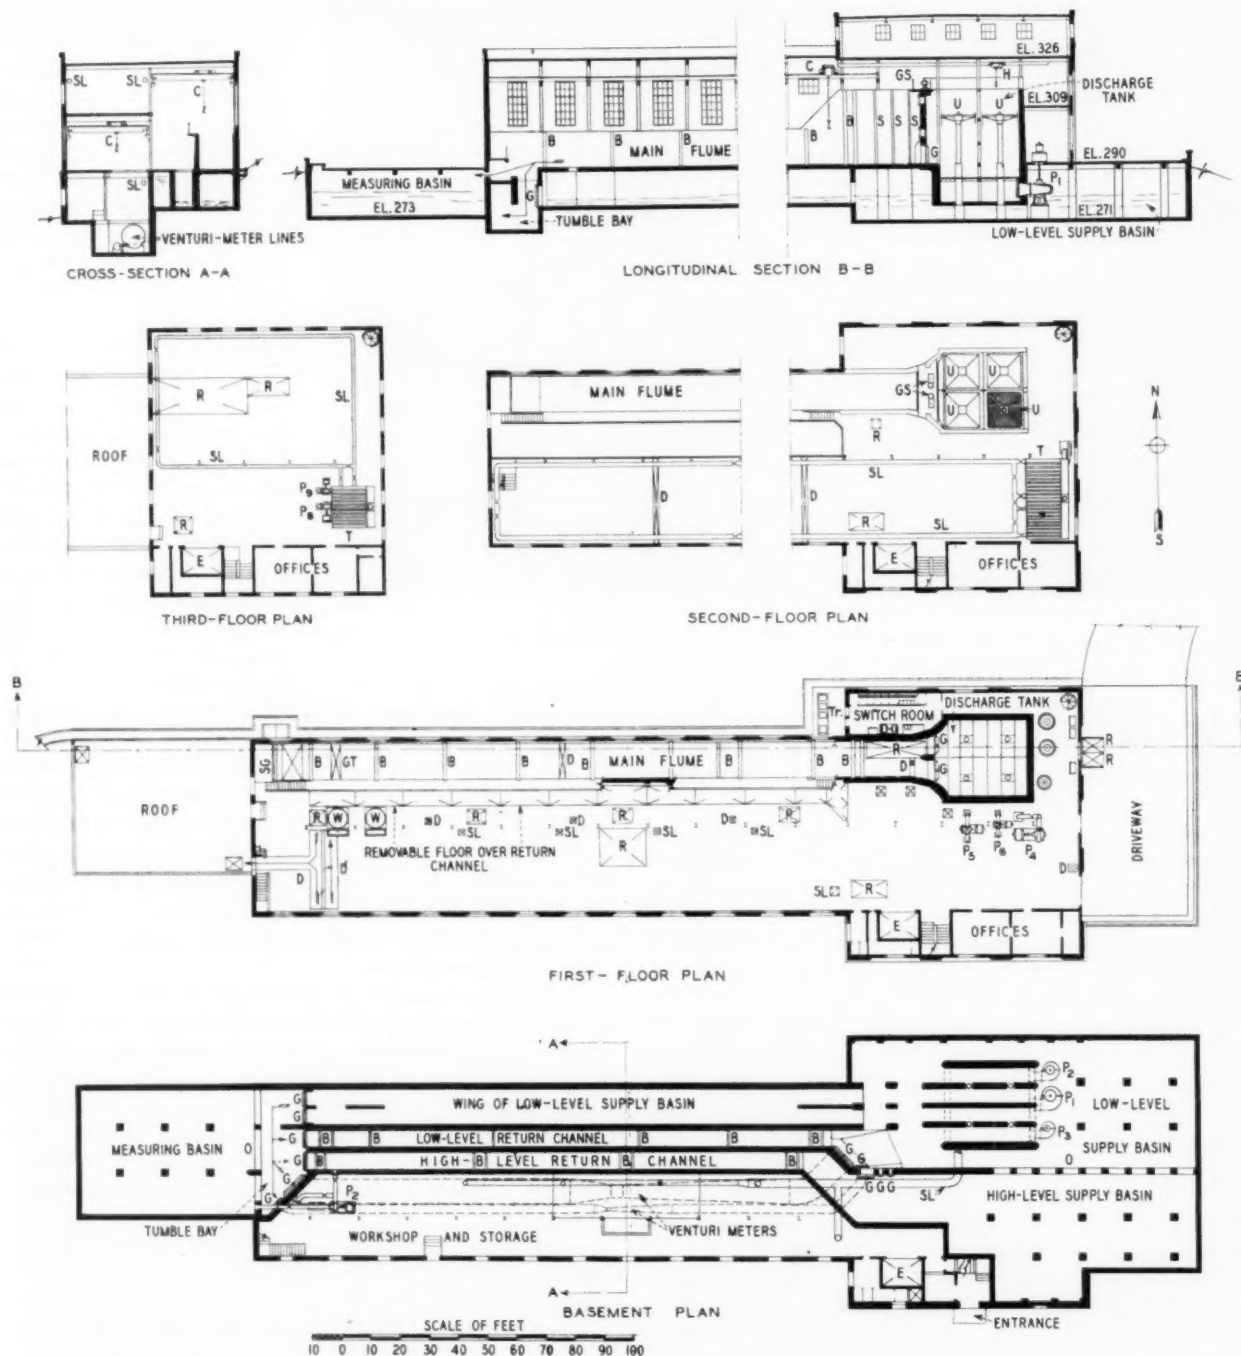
FLOOR PLANS AND SECTIONAL ELEVATIONS OF THE NATIONAL HYDRAULIC LABORATORY, WASHINGTON, D. C.
